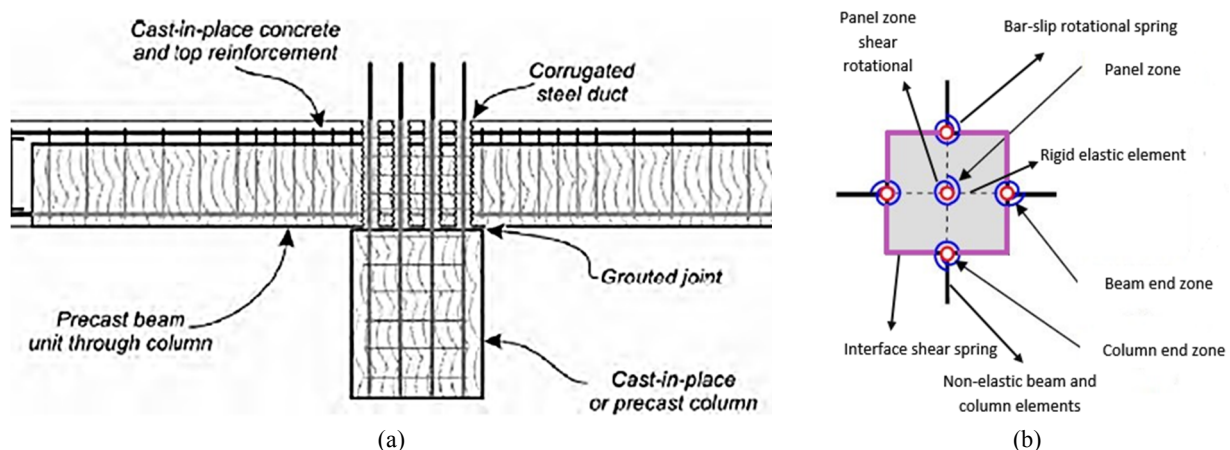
(a) Precast concrete grouted beam-column joint, (b) Analytical model of the beam-column joint.
